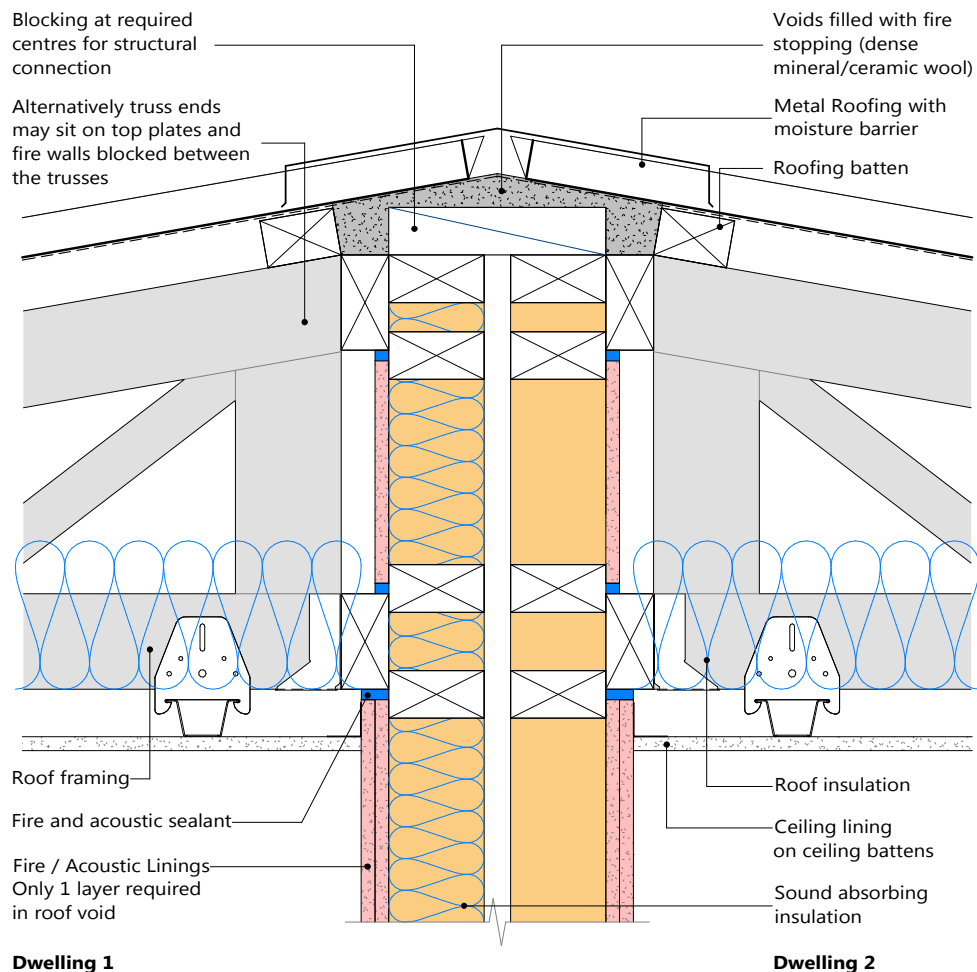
Typical detail for intertenancy wall at underside of roof (wall running perpendicular to rafters).
